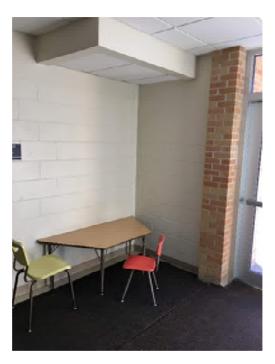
Interior wall construction is CMU throughout 1999 addition. Masonry in good condition.
